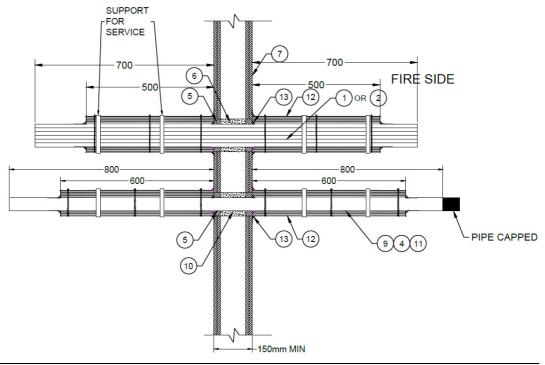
Typical Details for Cables wrapped with Emat for Plasterboard lined walls
